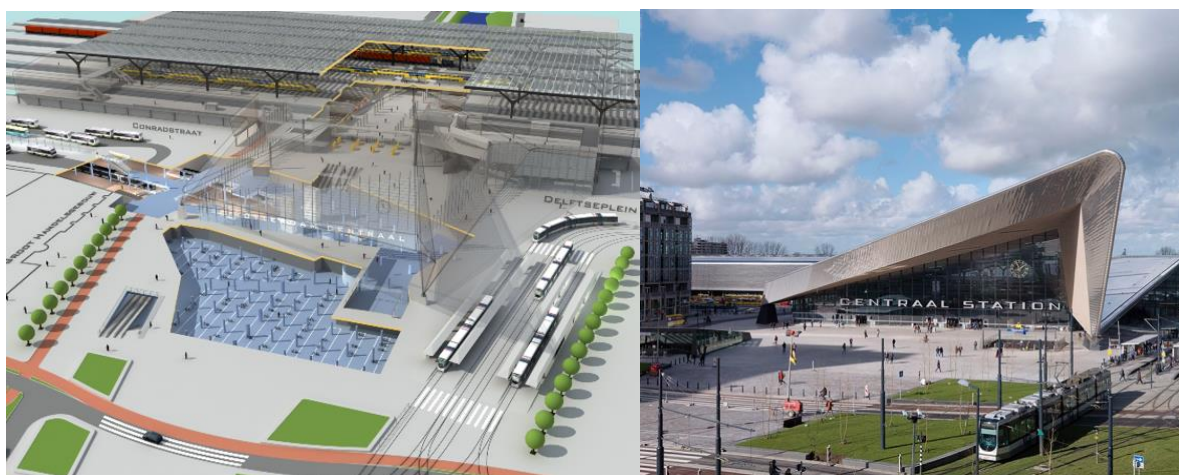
Rotterdam CS reconstruction (Source: Project plan Rotterdam CS)
